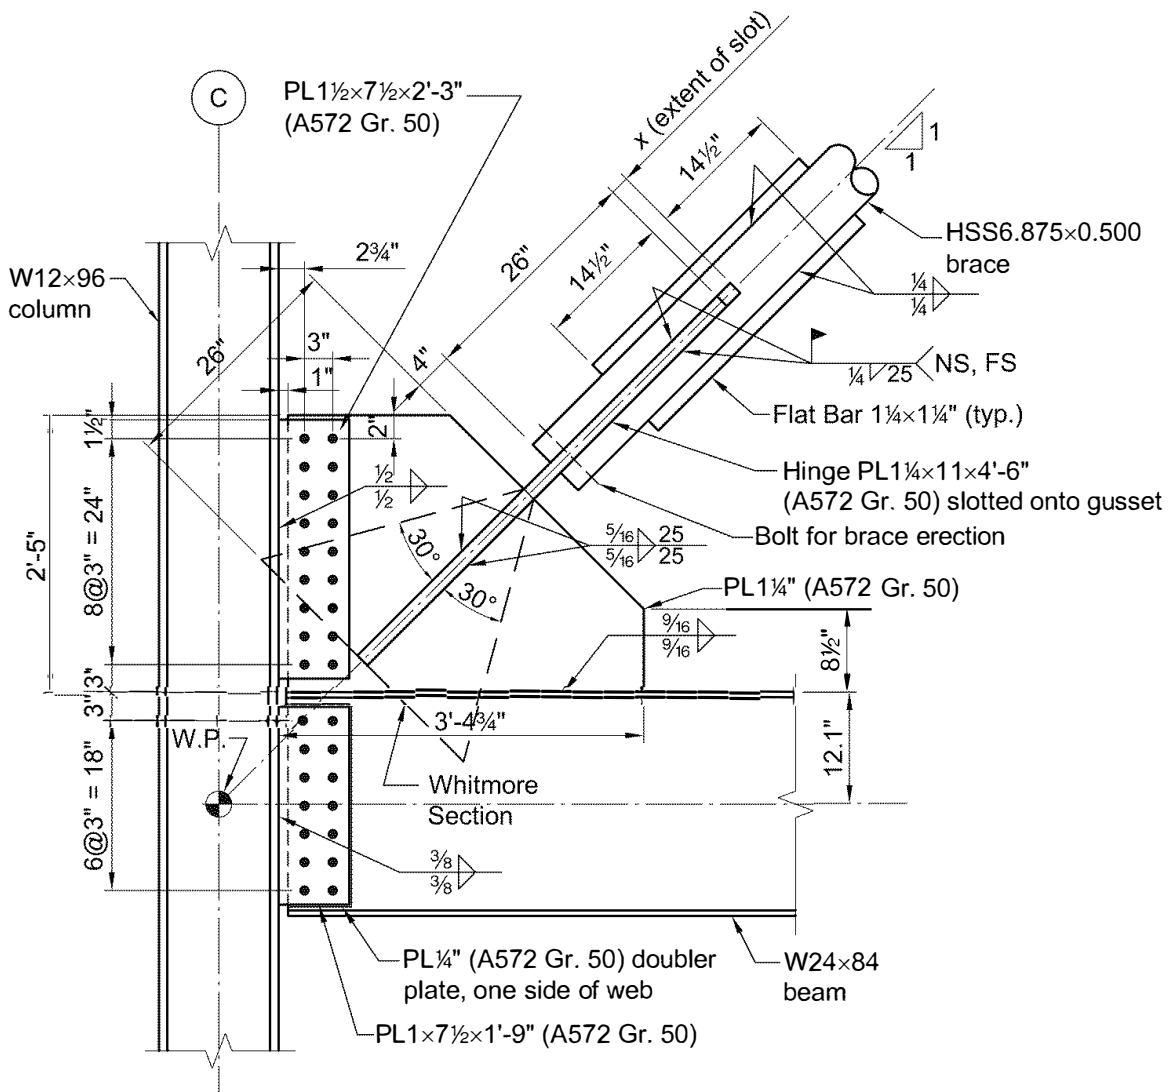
Brace connection to be designed for Example 5.3.11.
